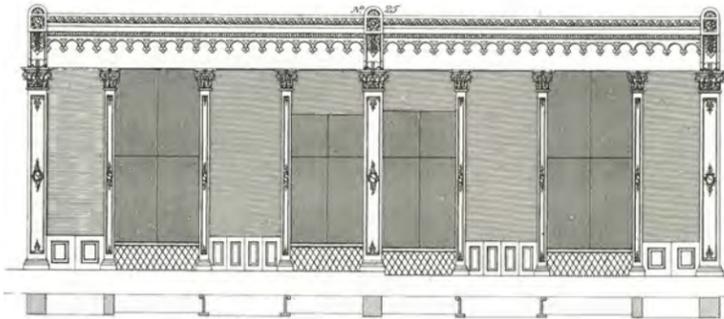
PLATE LXIV STOREFRONT FOR CHESTNUT STREET BUILDING, PHILADELPHIA PA
